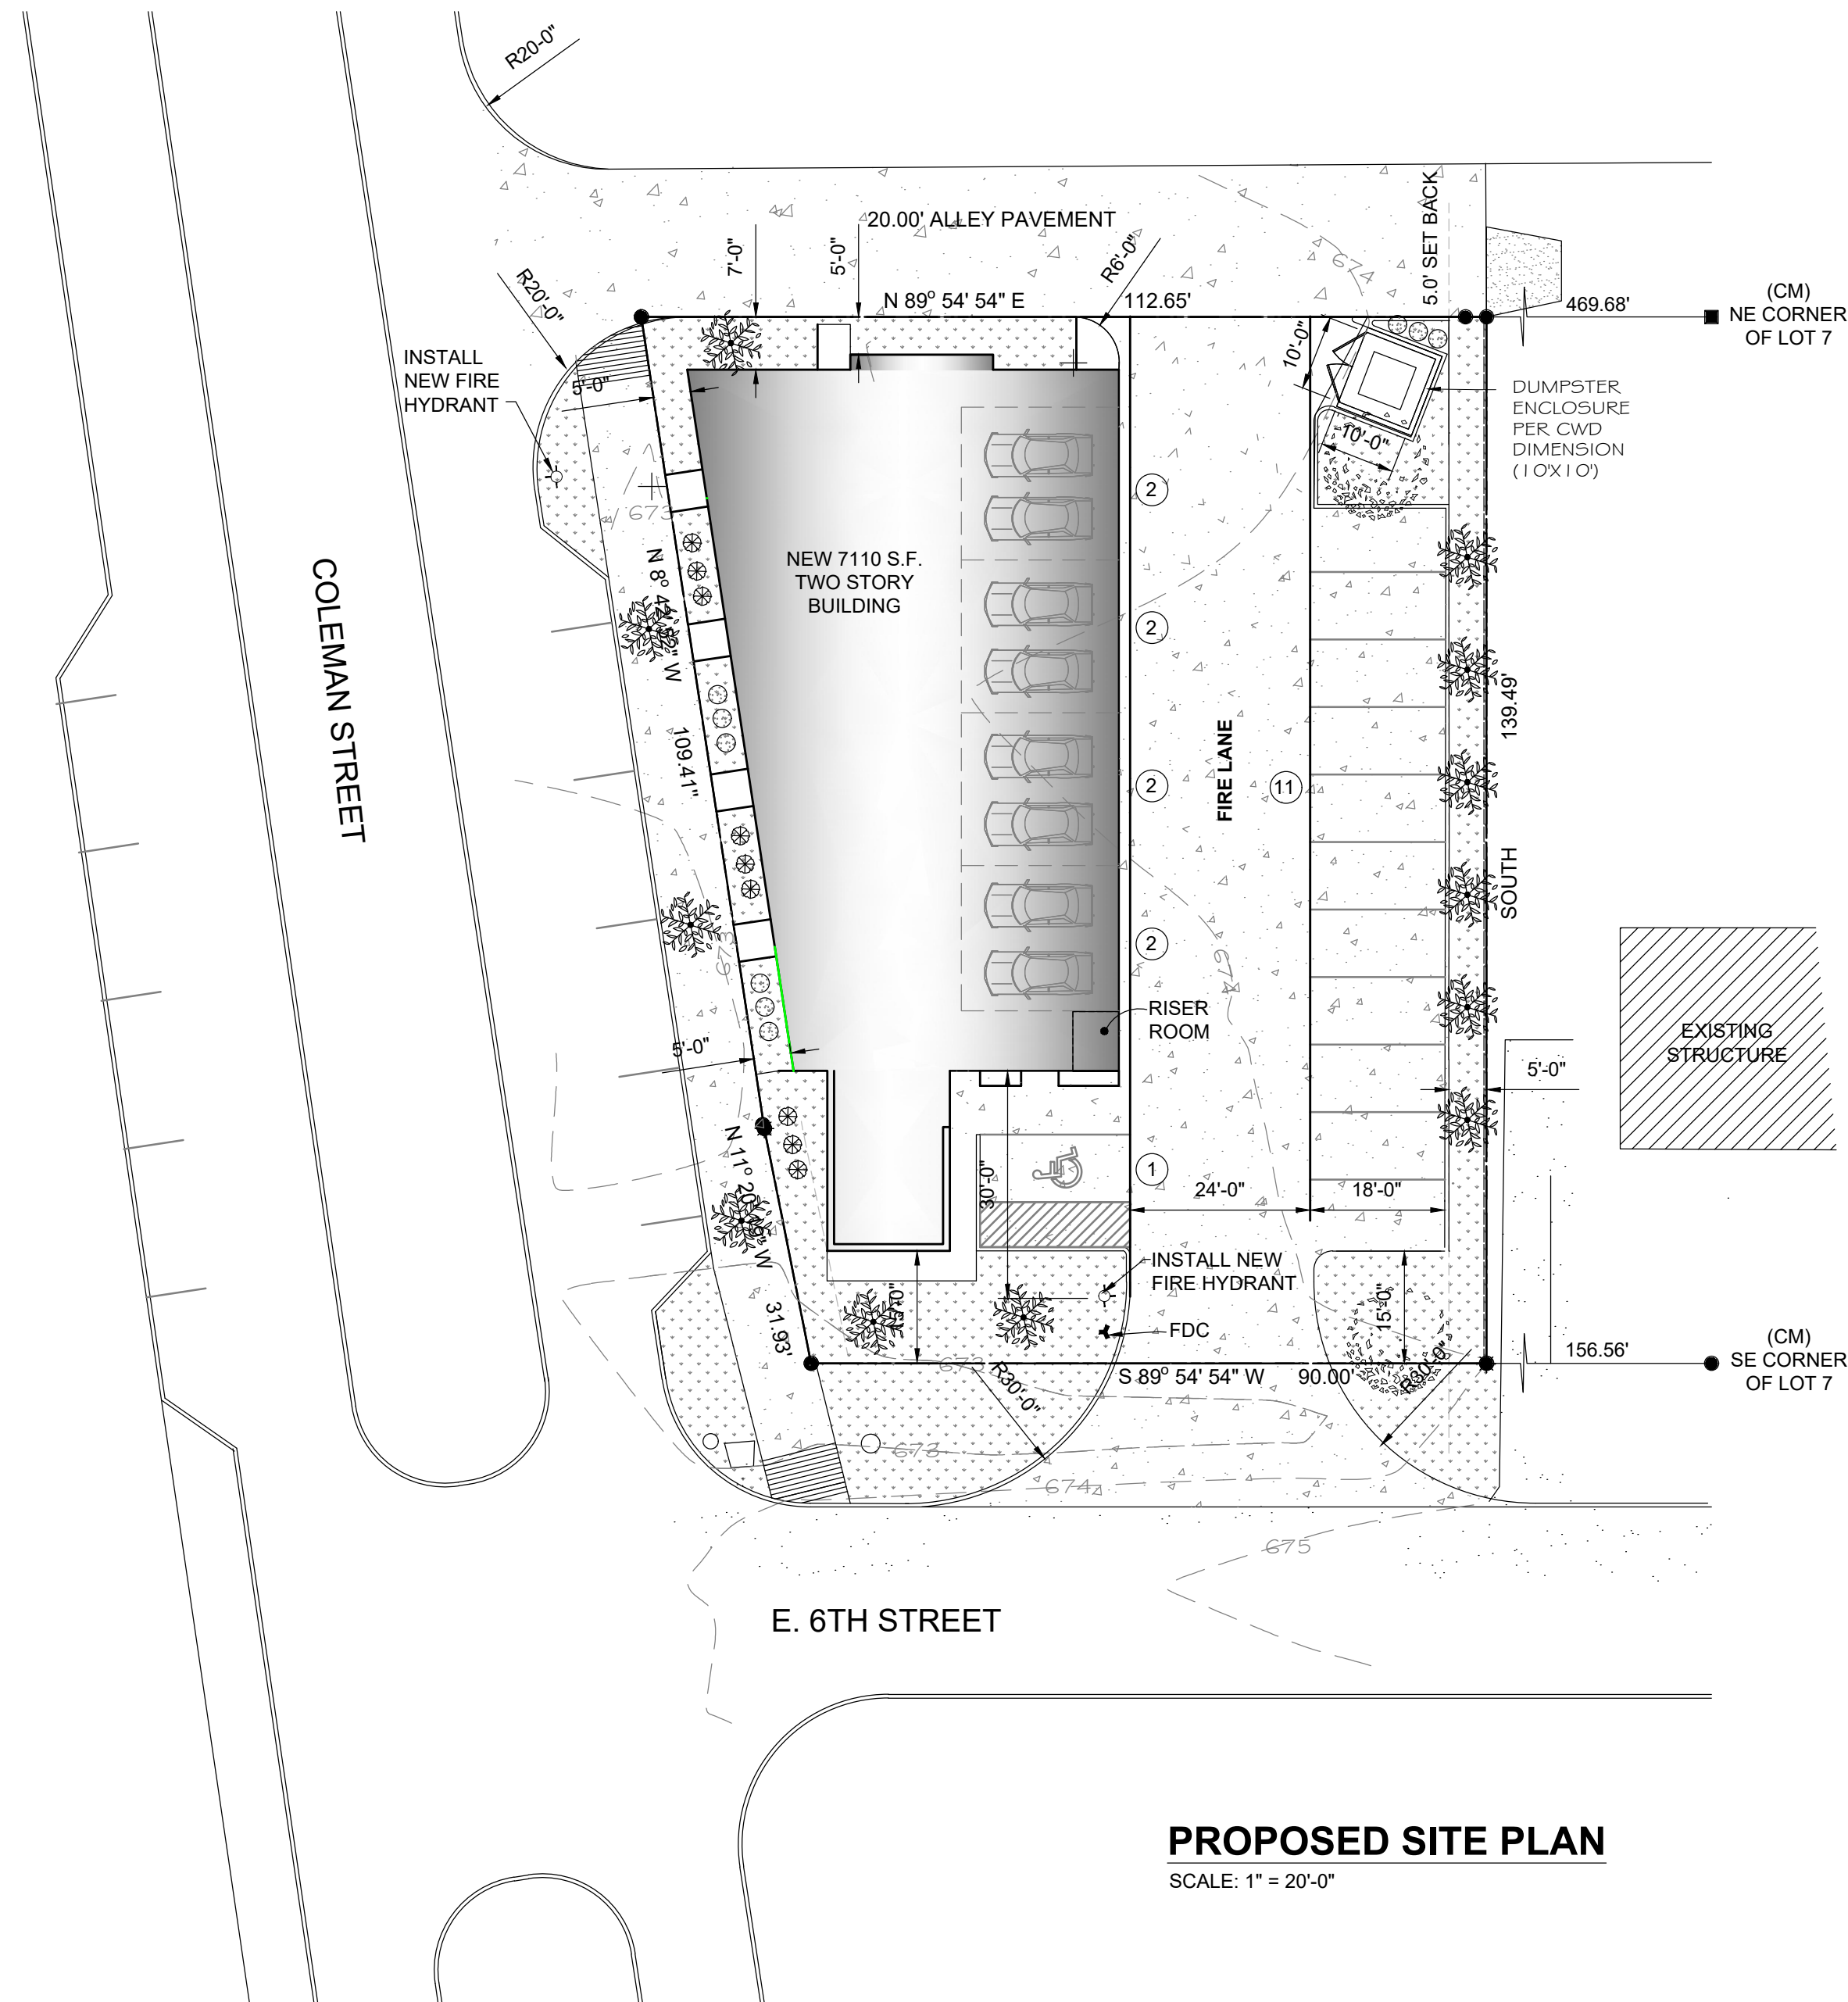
EXHIBIT D: CONCEPTUAL PLAN PROSPER CENTRAL ADDITION BLOCK 1, LOT 1 ZONE-23-0029
